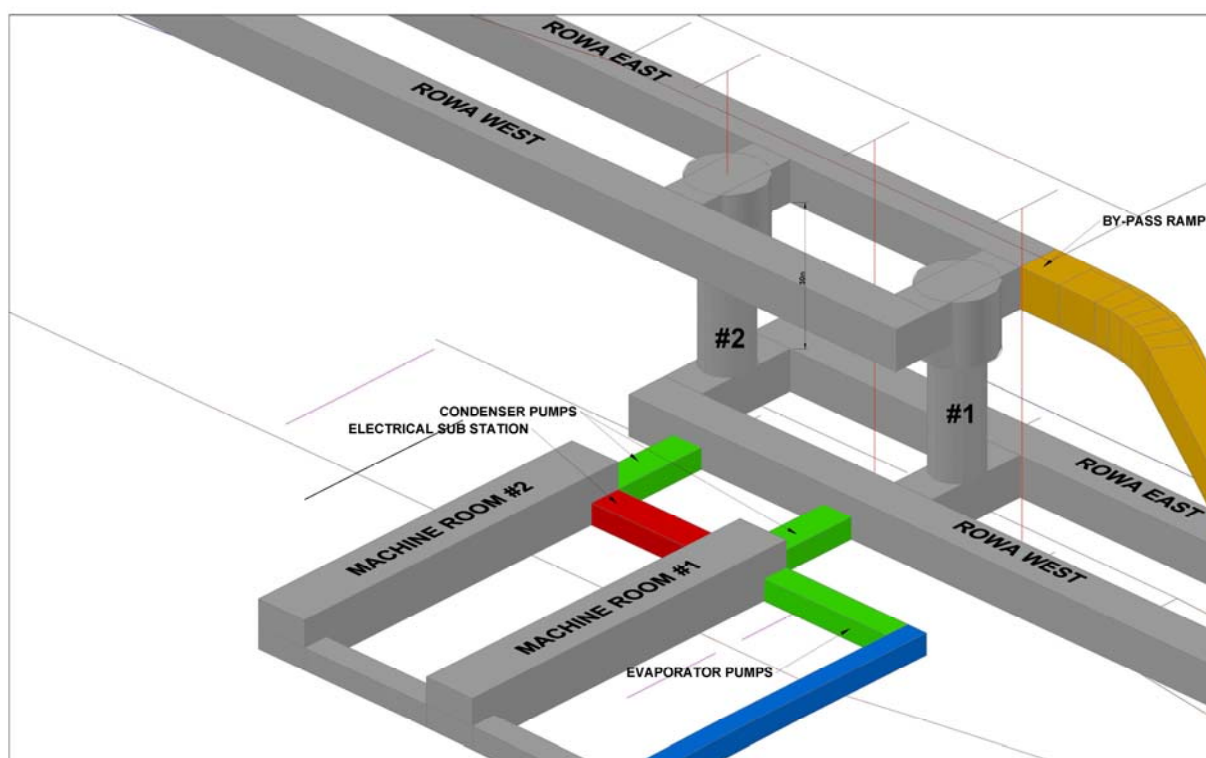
Underground Refrigeration Plant Excavation Layout
